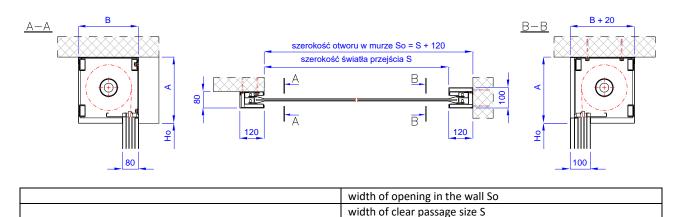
Fire protection window curtain type MARC-Ok(st) EI60
